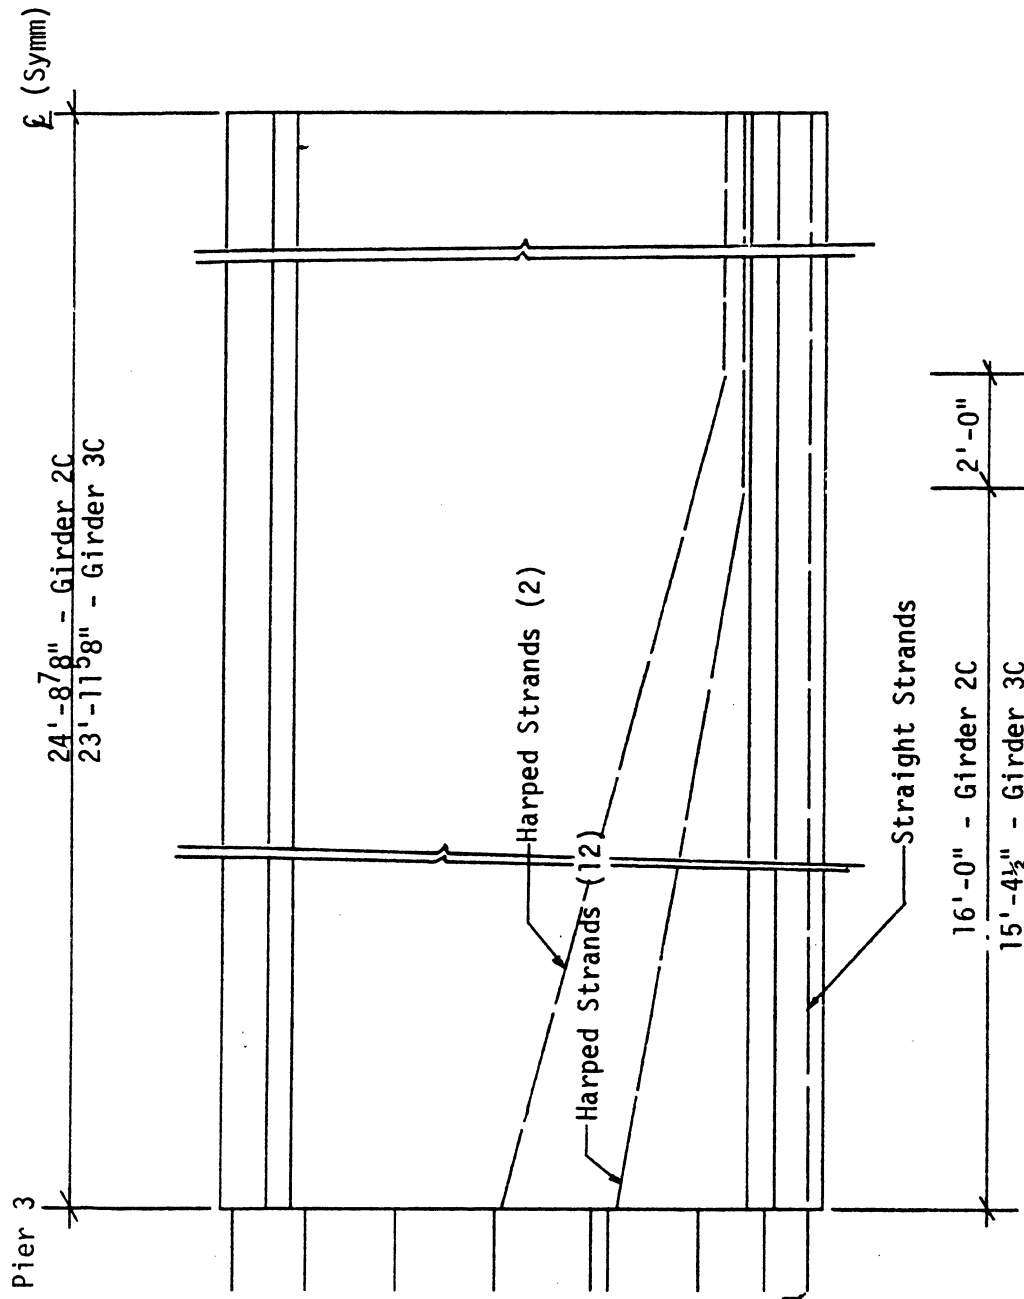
Field Test - Elevation of Girder 2C and 3C
